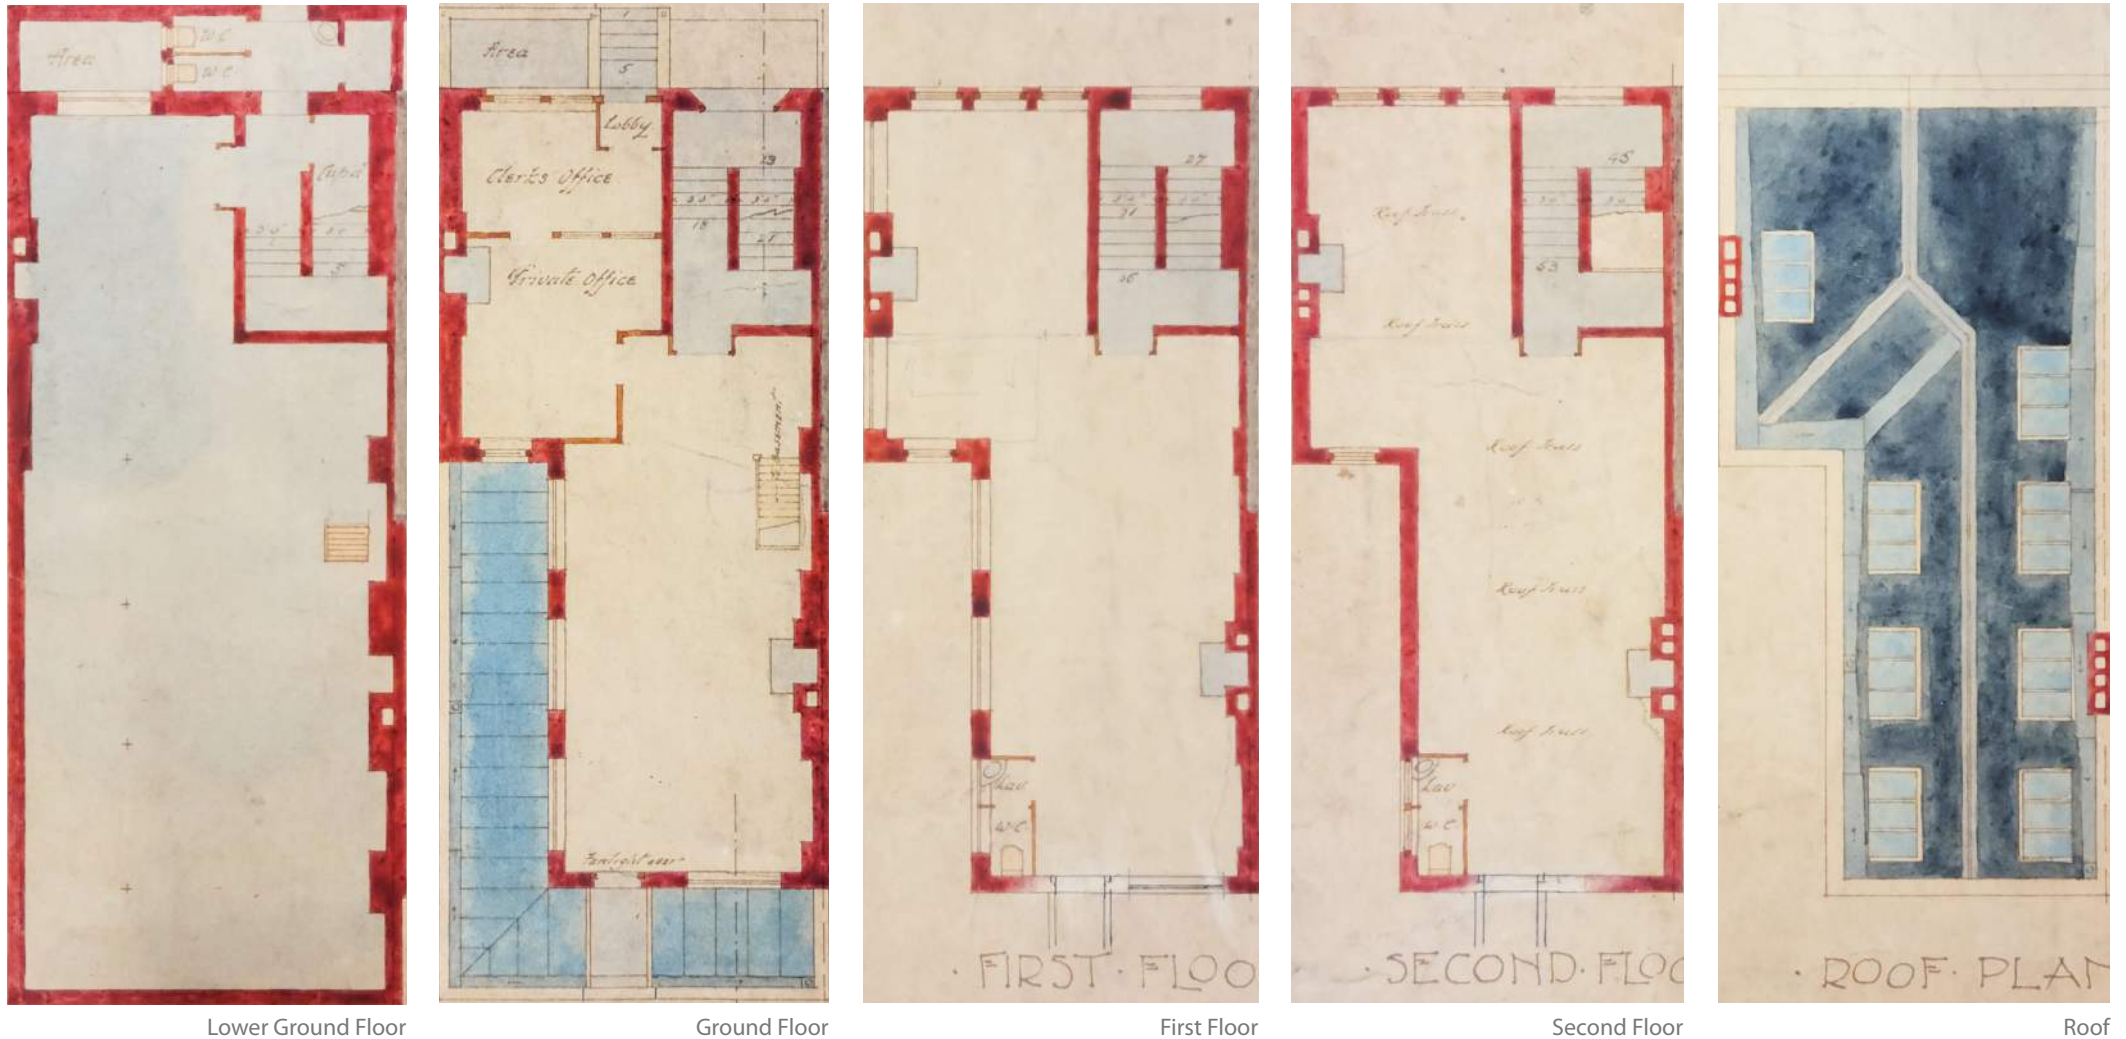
Excerpt from *Plans, Section and Elevation of factory in Kenton Street for Messrs Jaques and Son, 1905
